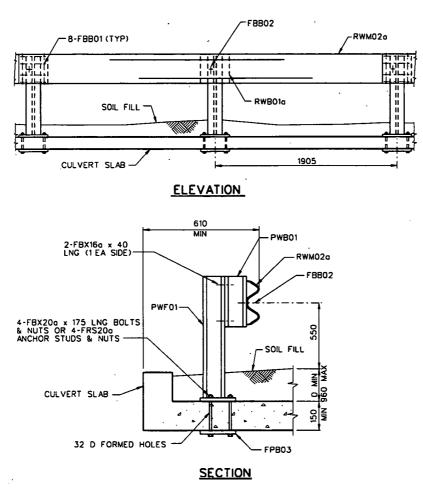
Culvert-mounted strong-post W-beam guardrail (SGR05) (22).
